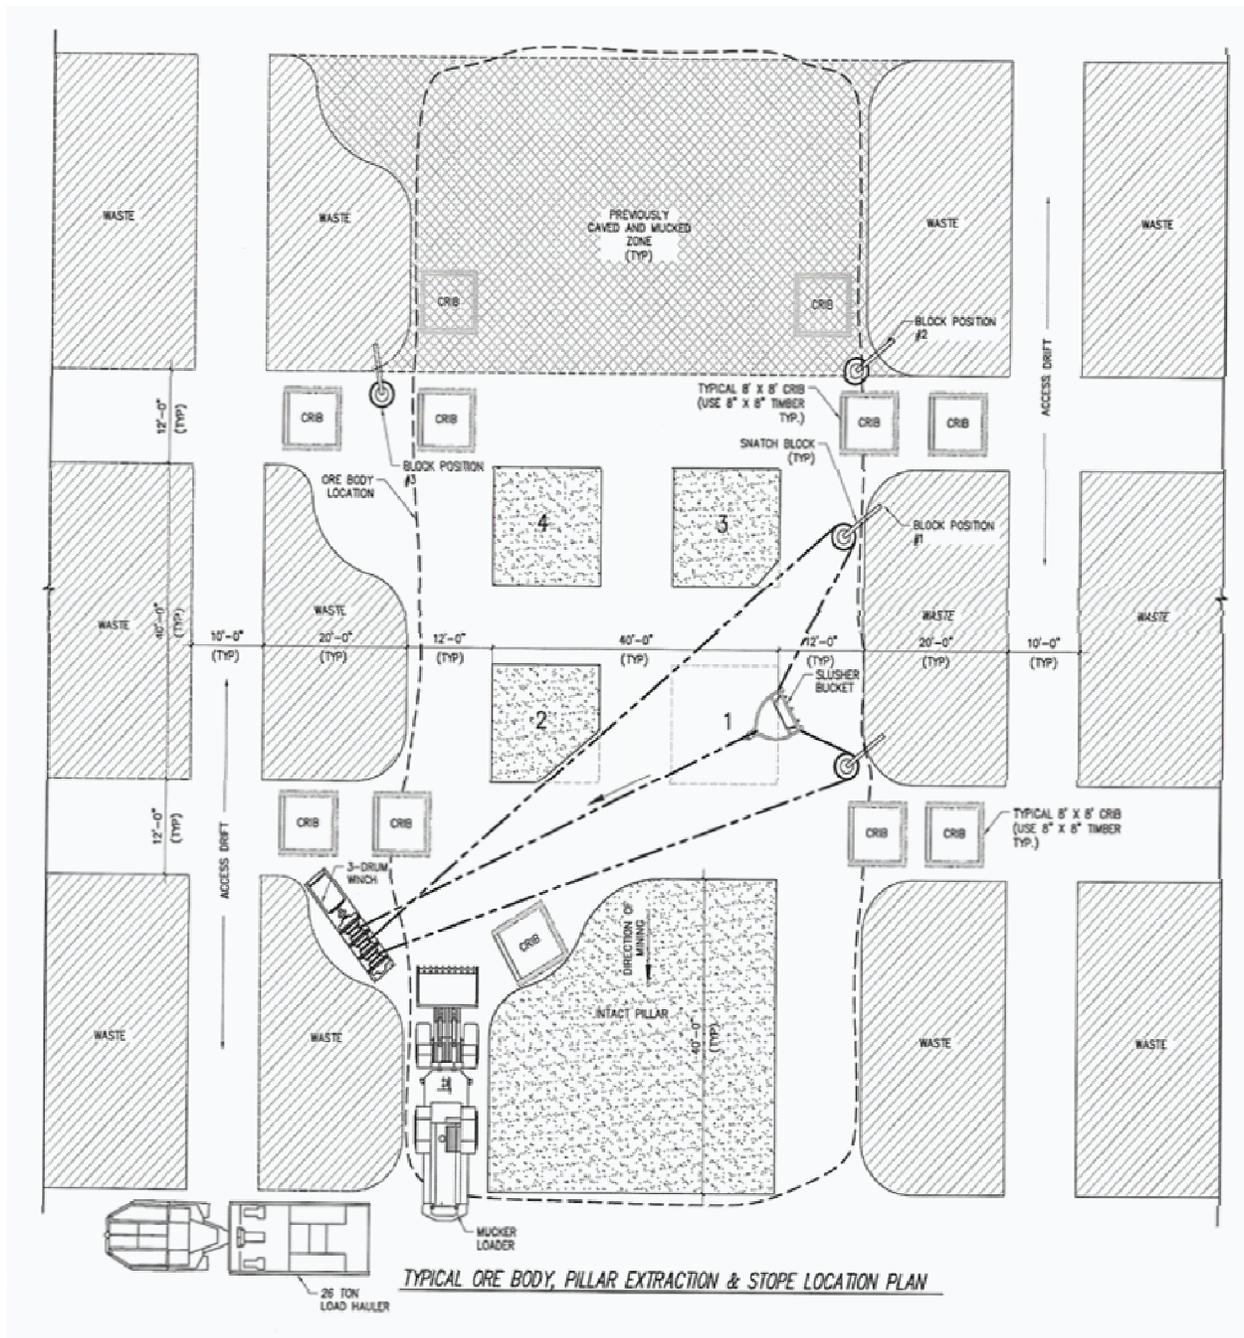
Typical Ore Body Pillar Extraction and Stope Location Plan
